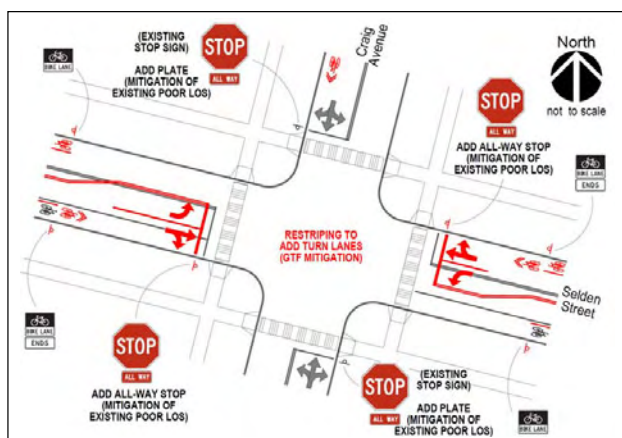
Intersection Improvements at Selden Street and Craig Avenue
